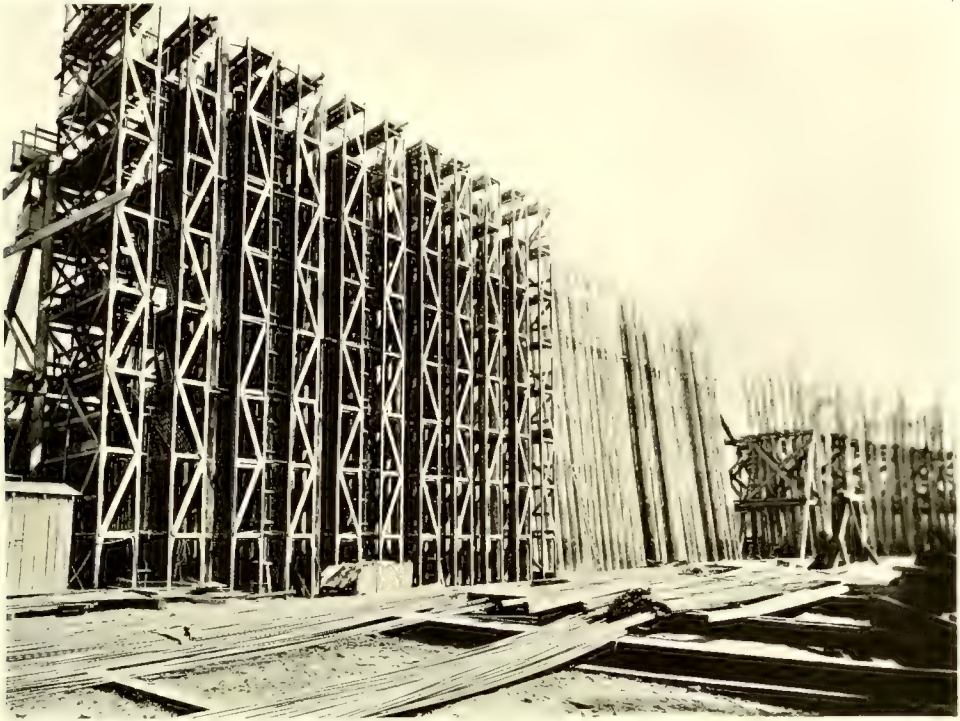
Gunite concrete piling and plant, Los Angeles.
